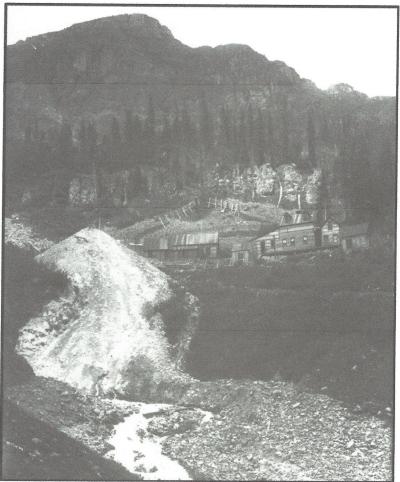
Silver Crown Mine showing the buildings constructed in 1906 with the avalanche splitting berms on the slope above.
